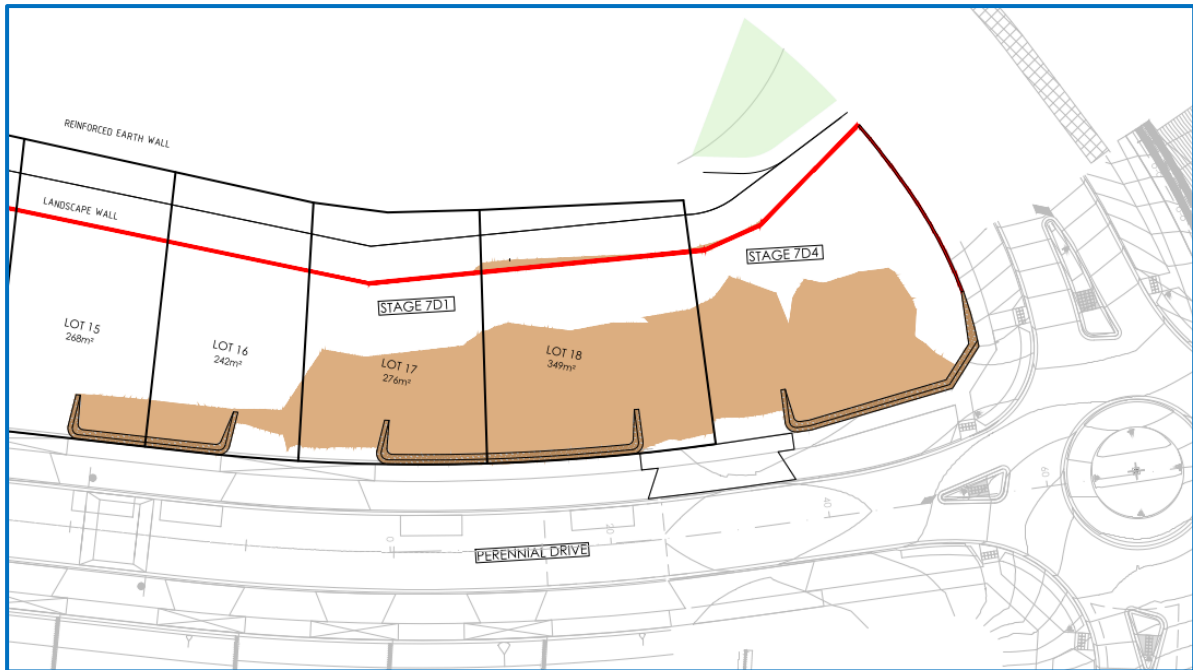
Extract from CJ Arms drawing titled 'Fill Layout Plan', Project No.15006, Drawing No.9901, Sheet 2 of 2, Rev 1
